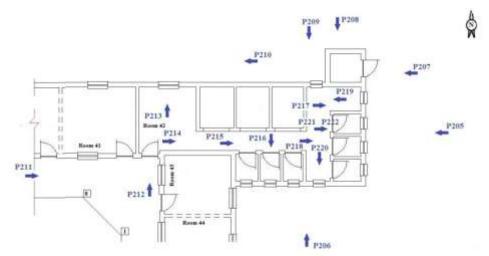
Above is the schematic representation of the layout of Drawing 9 with places where photos were taken from are marked. (Drawing S.M. Miller 2016.)
